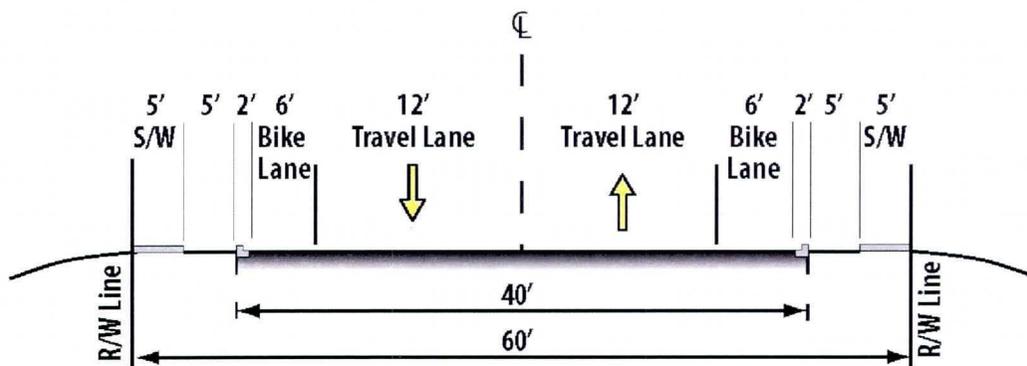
Ultimate Roadway Cross Section – Lost Dutchman Boulevard to McDowell Boulevard
